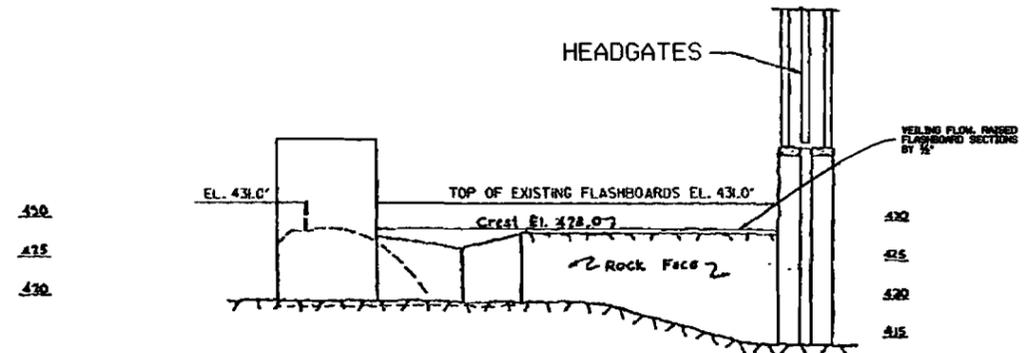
EXHIBIT F SCALE AS NOTED SHEET NO. 1
